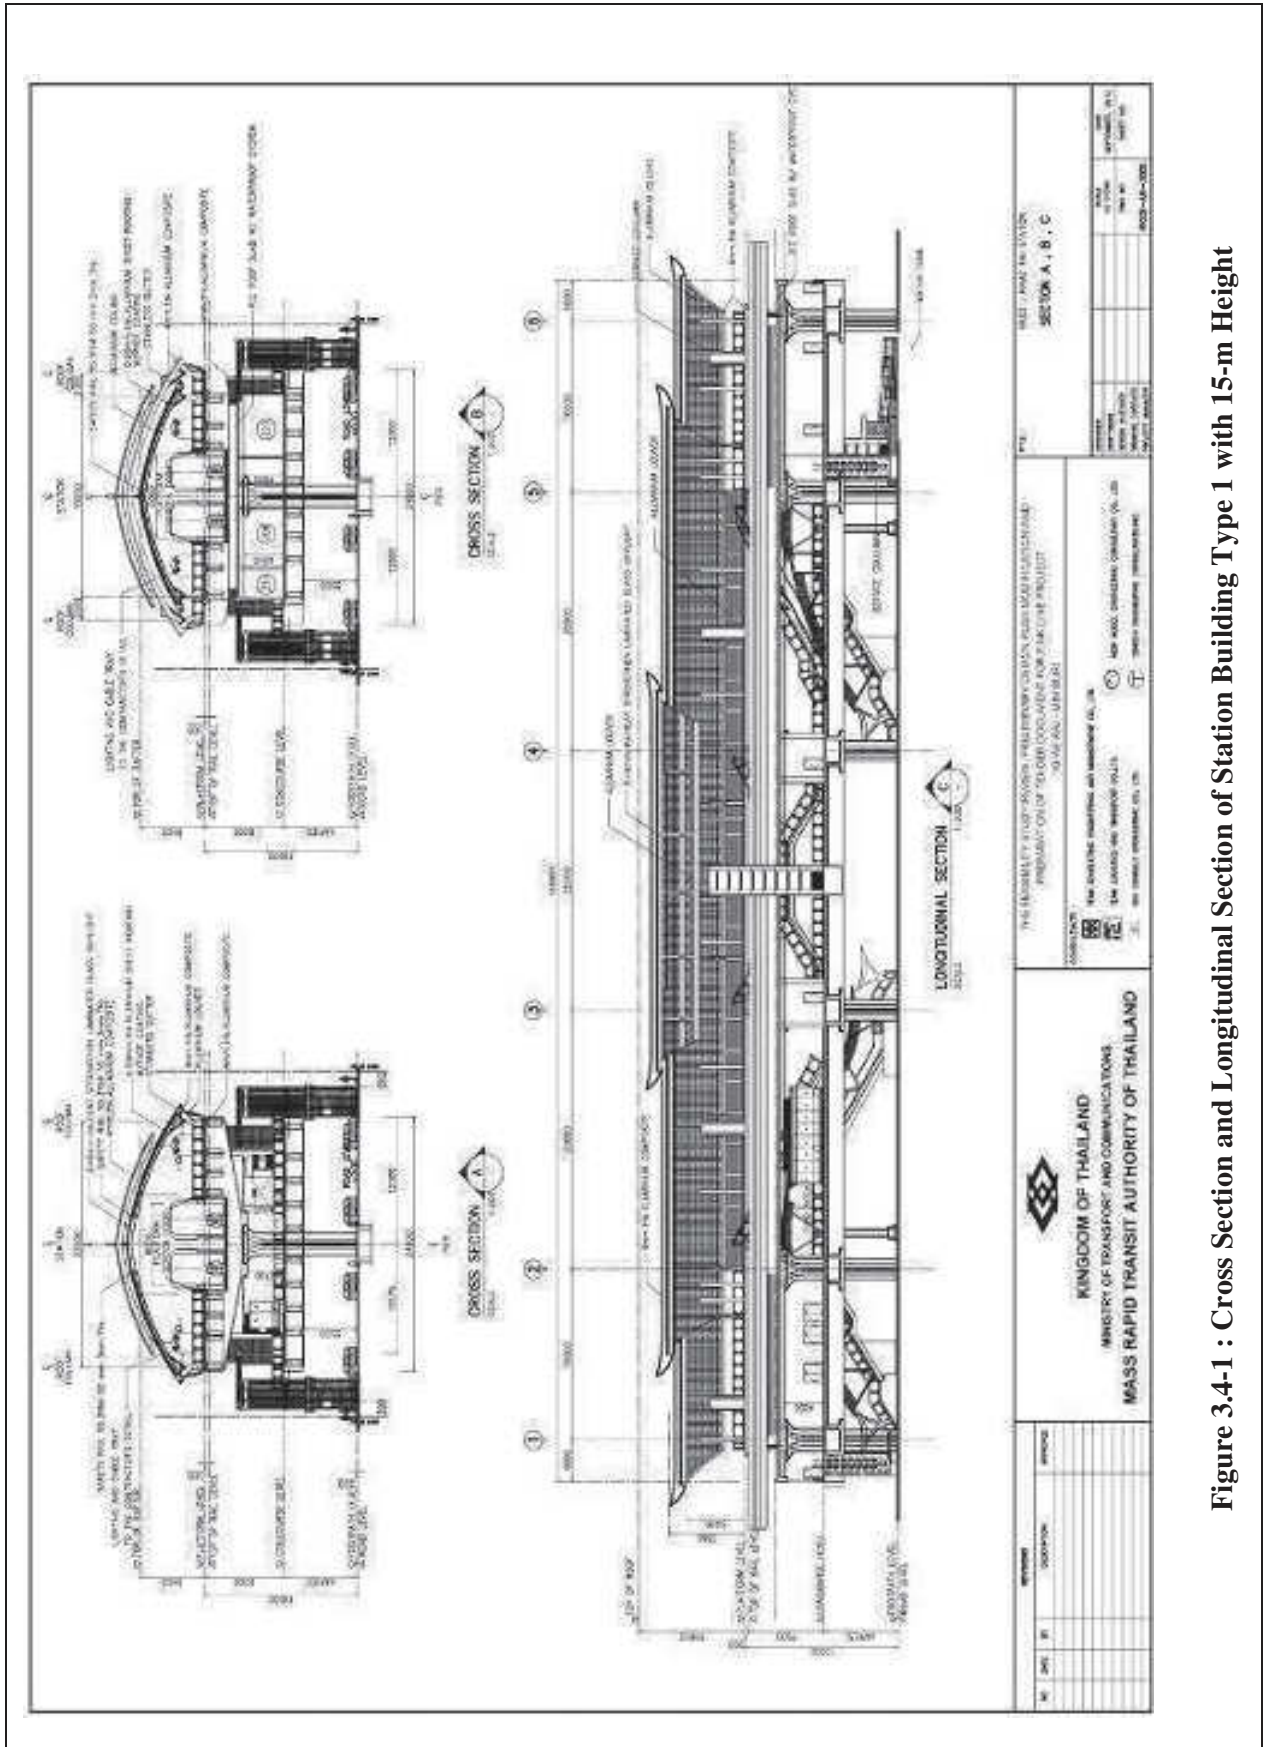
Cross Section and Longitudinal Section of Station Building Type 1 with 15-m Height
